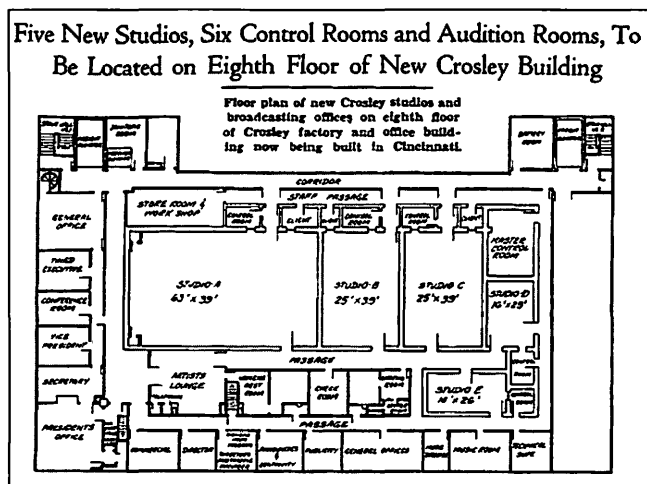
WLW / WSAI studio floor plan at Arlington Street.
